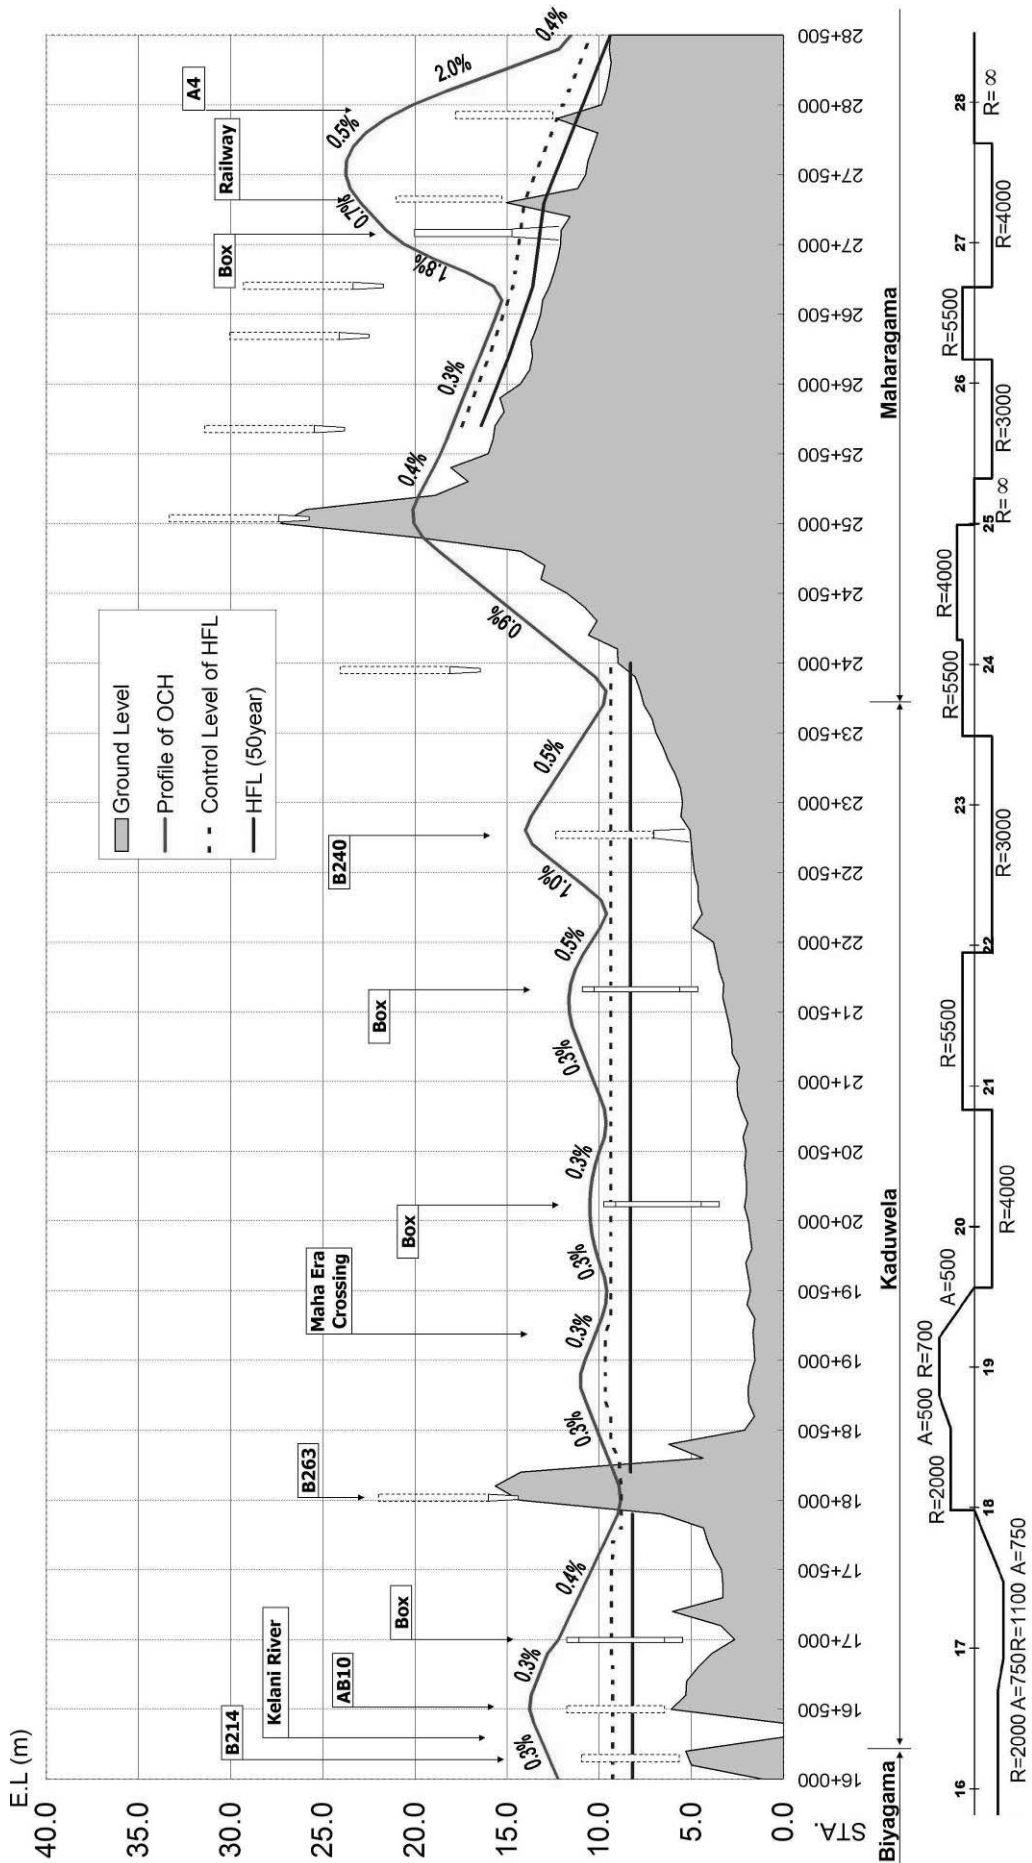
Vertical Alignment for OCH Southern Section
